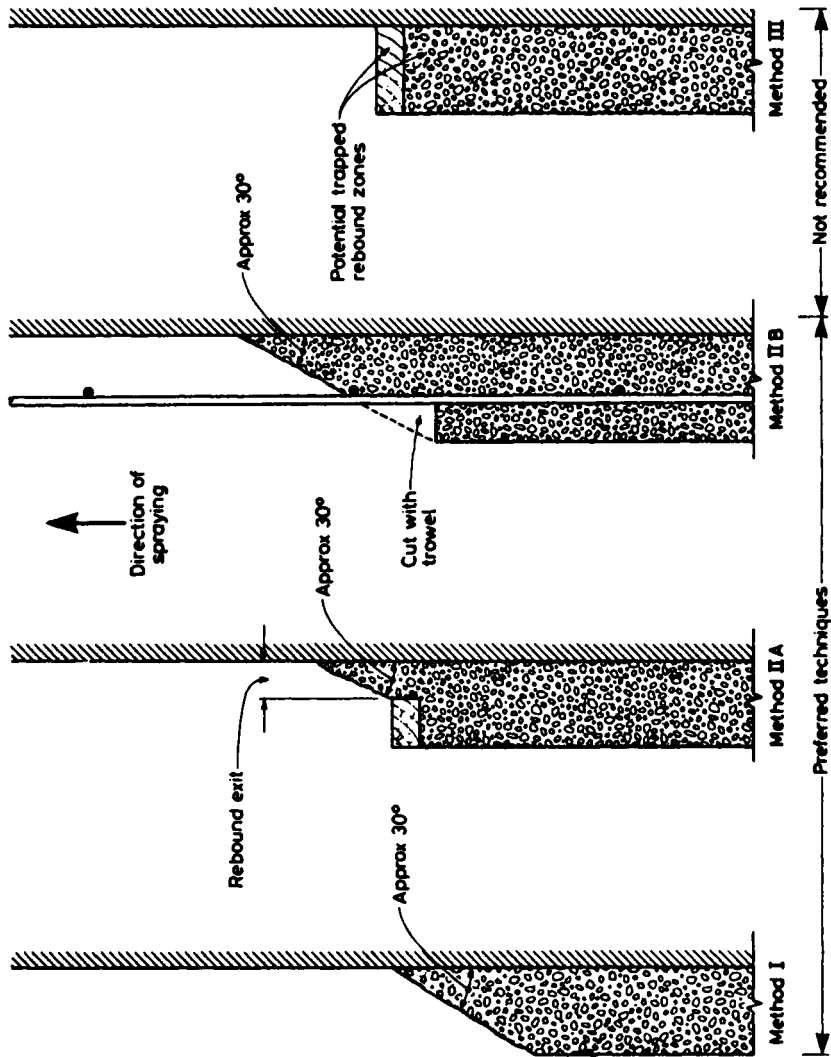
Formation of construction joints (Concrete Society, ref.6)
